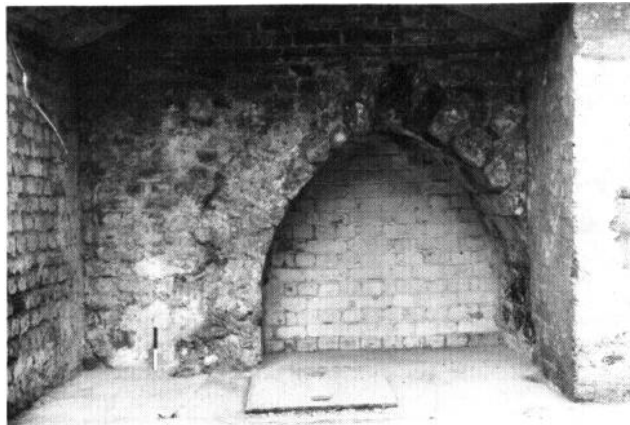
15-35 Copthall Avenue, watching brief: blocked-in medieval culvert on London Wall frontage. Scale in 0.10m units
